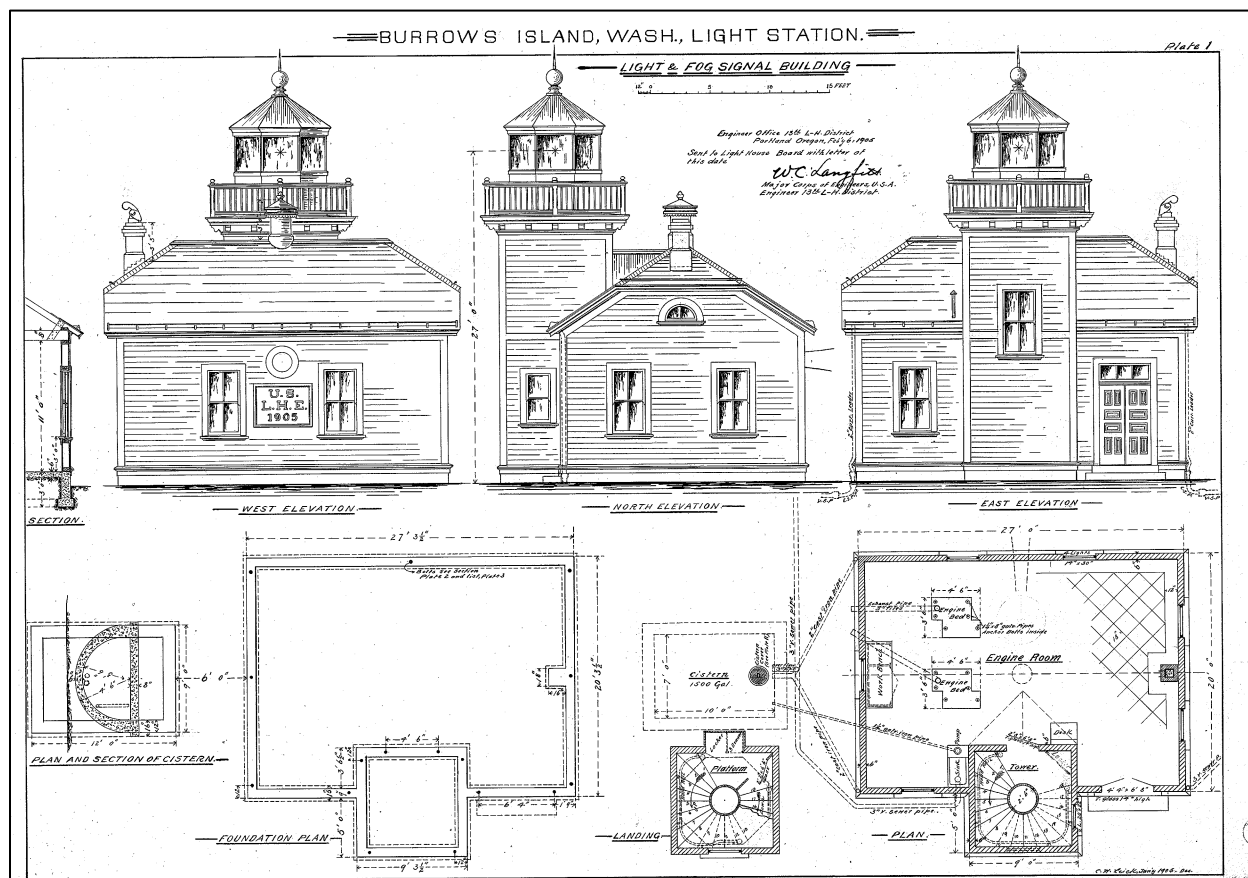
of 42: Elevations and plans of the Light Tower and Fog Signal Building in 1905.⁷¹
